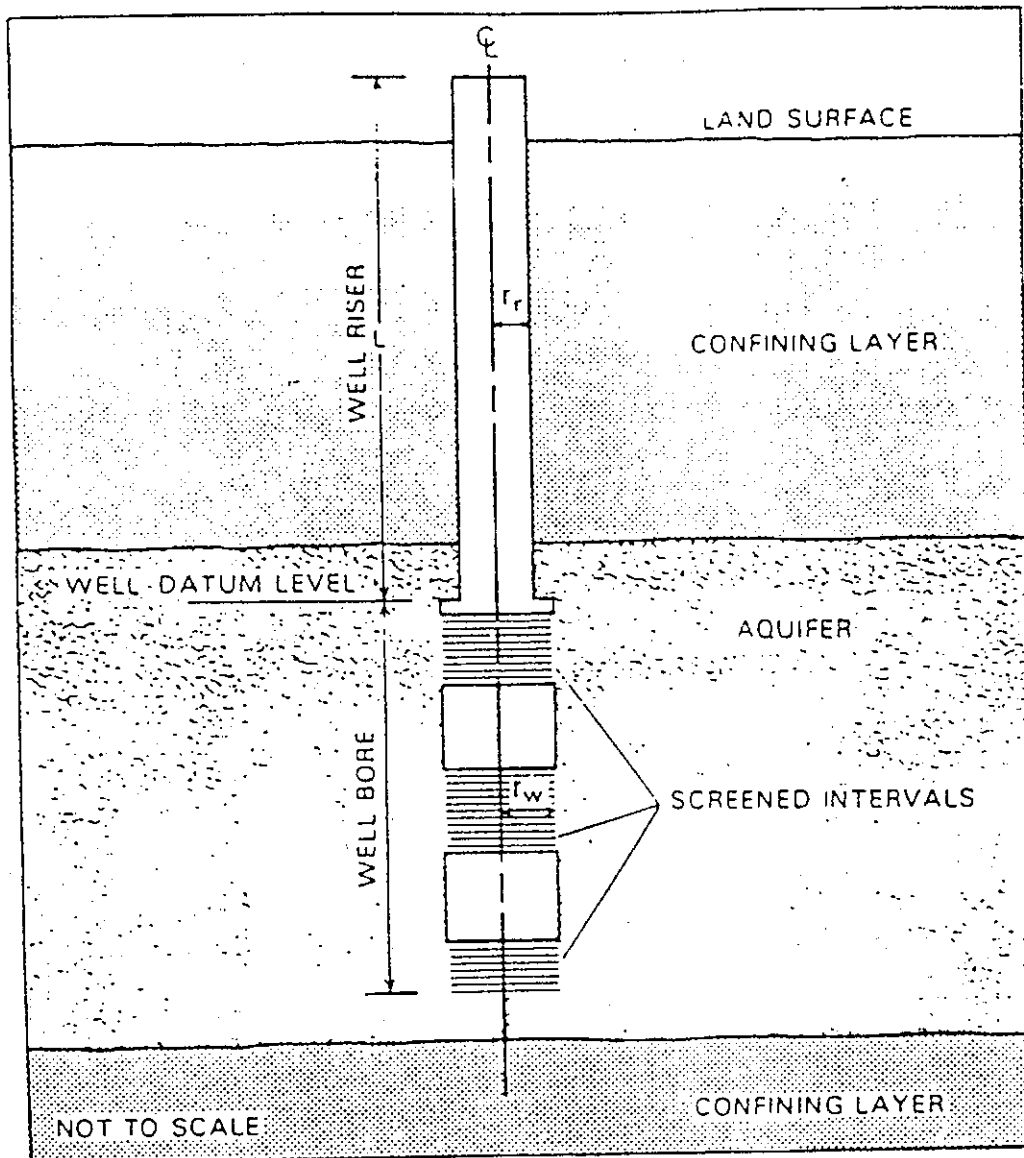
Well Model Geometry Sketch Showing the Well-Bore and Well-Riser Sections and the Well-Datum Level.
